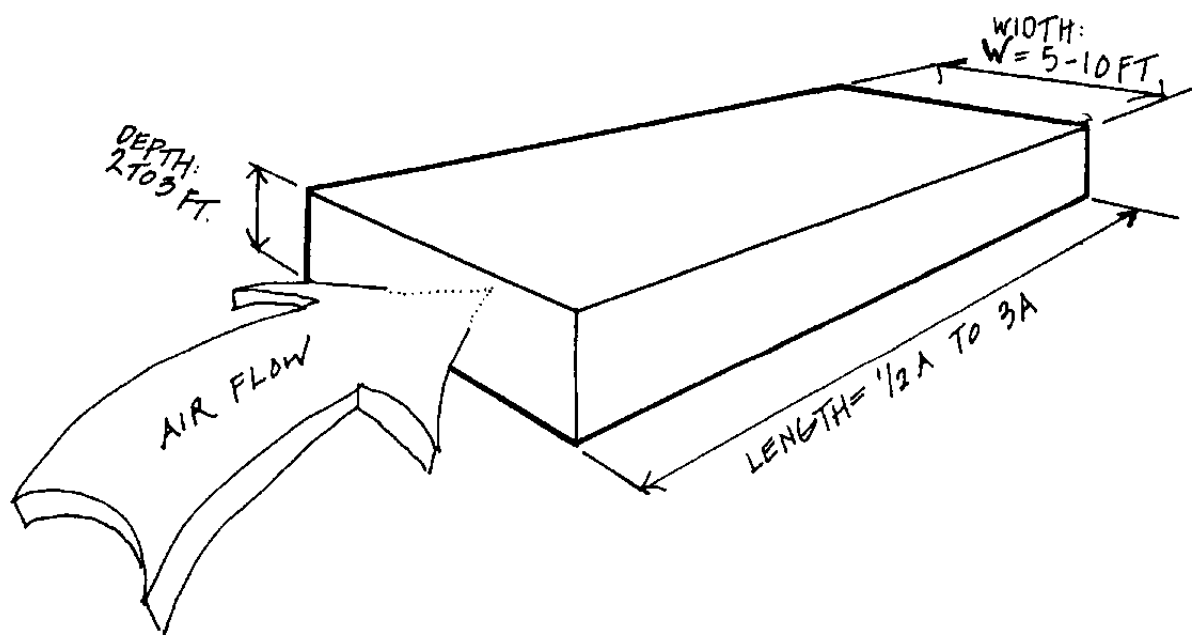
Preferred configuration for horizontal gravel beds under floor slabs and planting beds (PUT).
